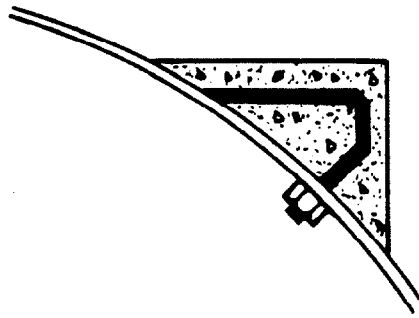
Concrete thrust beam used as a longitudinal stiffener.<sup>(3)</sup>
